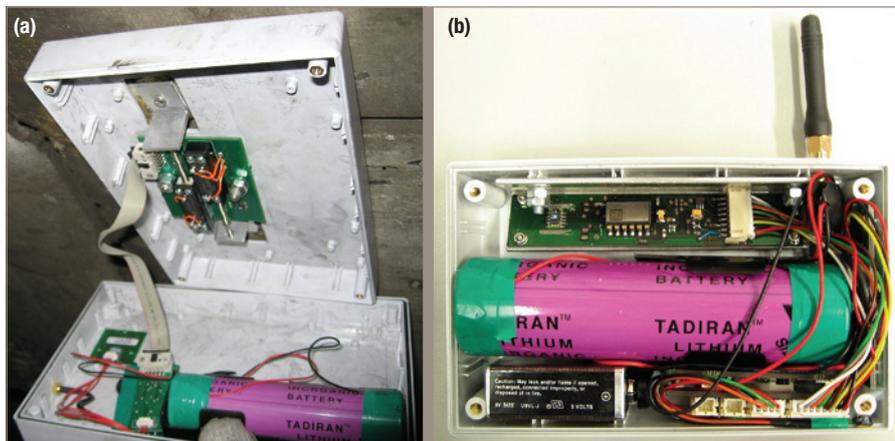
London Underground sensor nodes, which had to protrude no more than 35 mm from the tunnel wall: (a) displacement transducer to measure movement at tunnel crown and crack widths; (b) inclinometers installed on precast concrete tunnel lining panels
